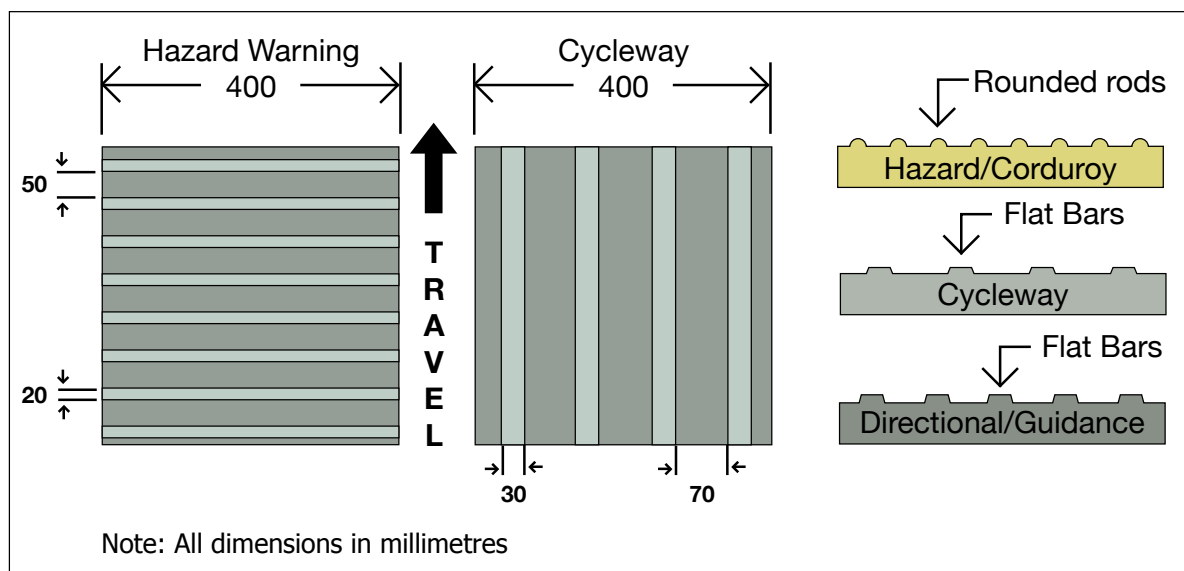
and Image 1.42 Note that the tactile paving is aligned longitudinally for the cycleway section (right-hand side) and transversely for the pedestrian section (left-hand side).
